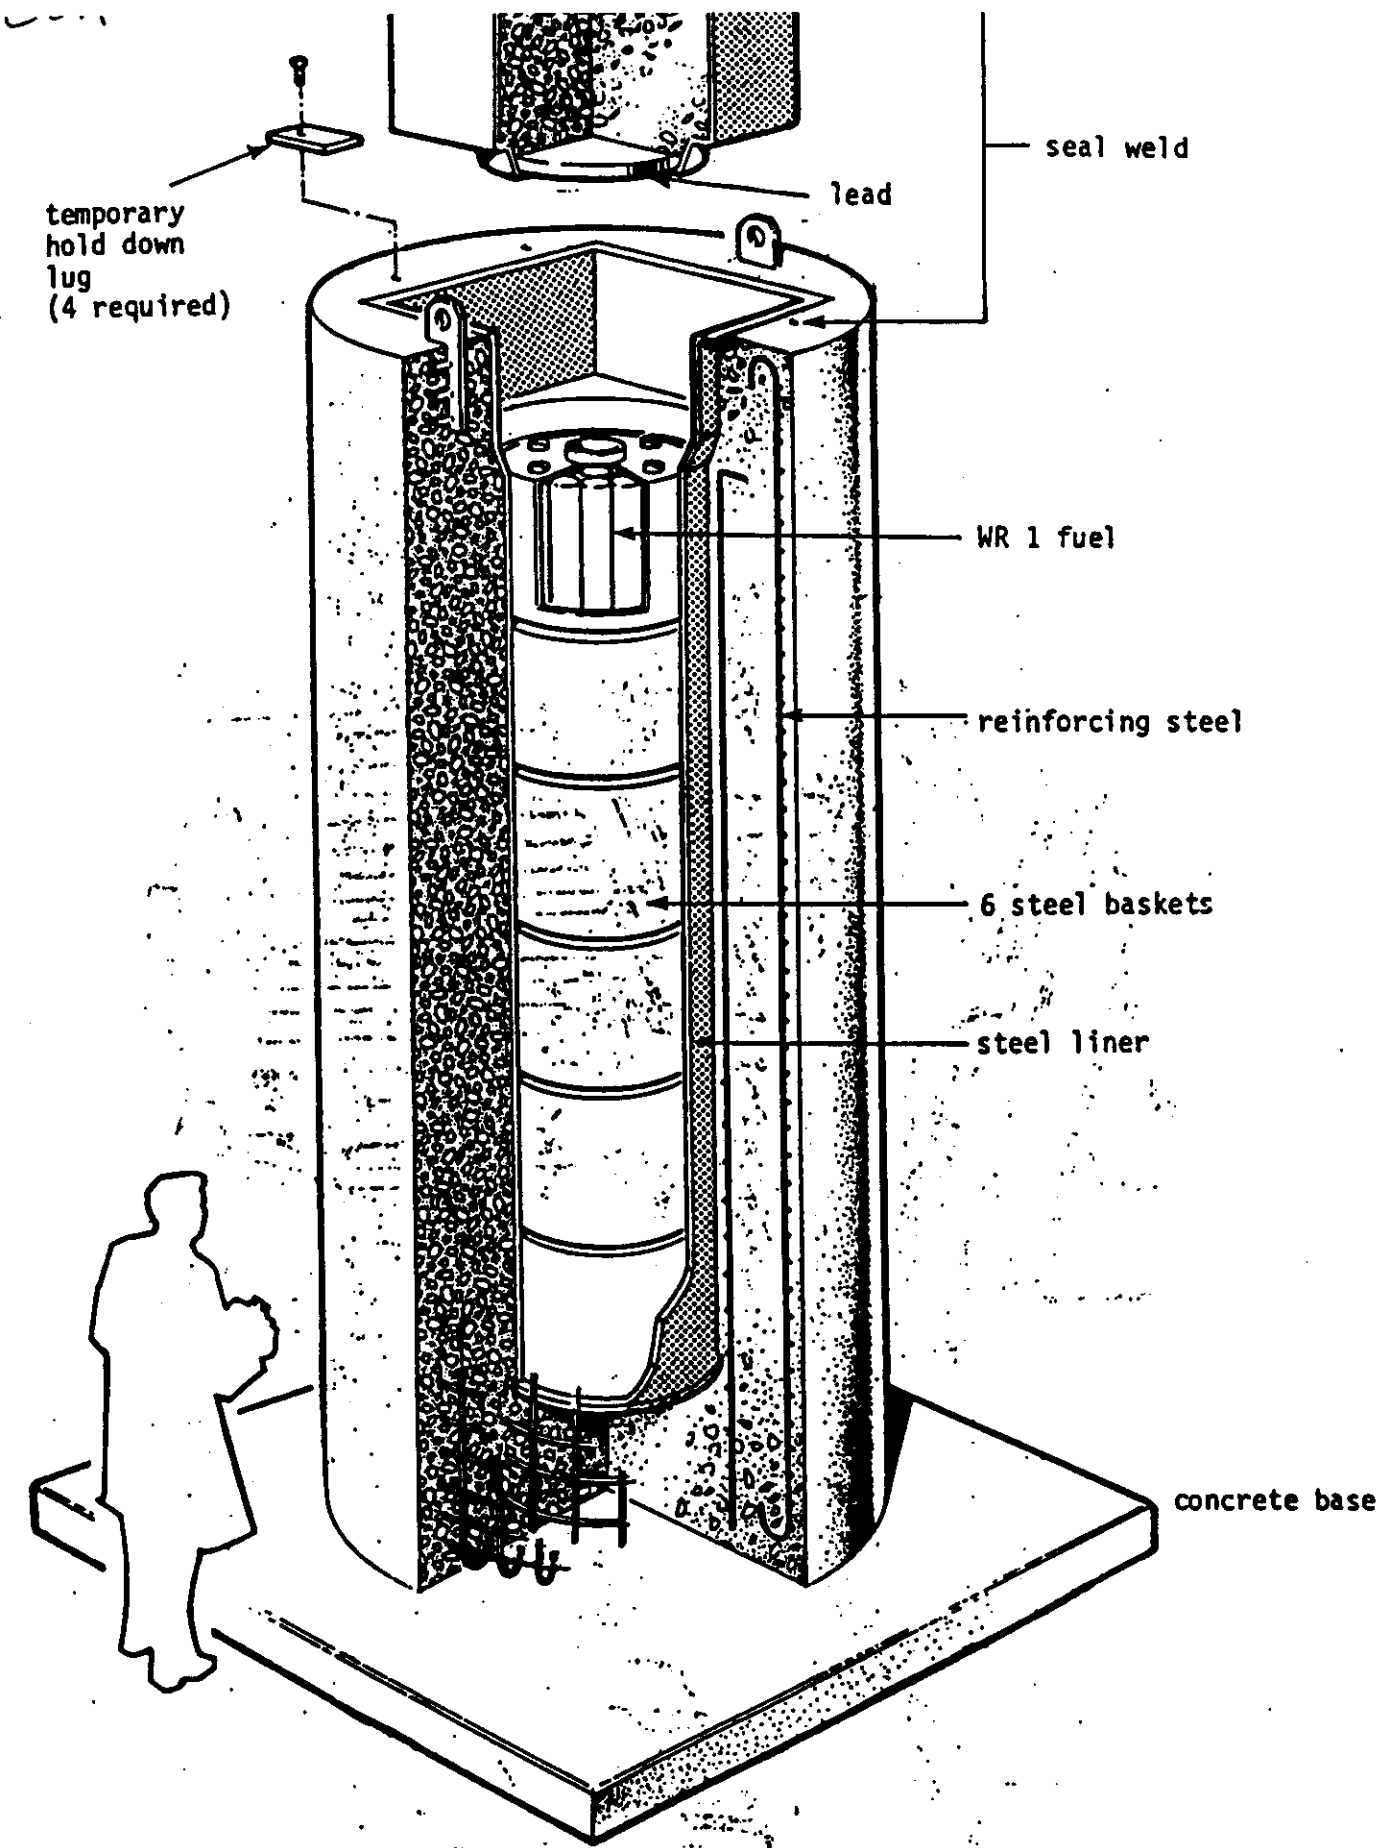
CYLINDRICAL CONCRETE CANISTER
